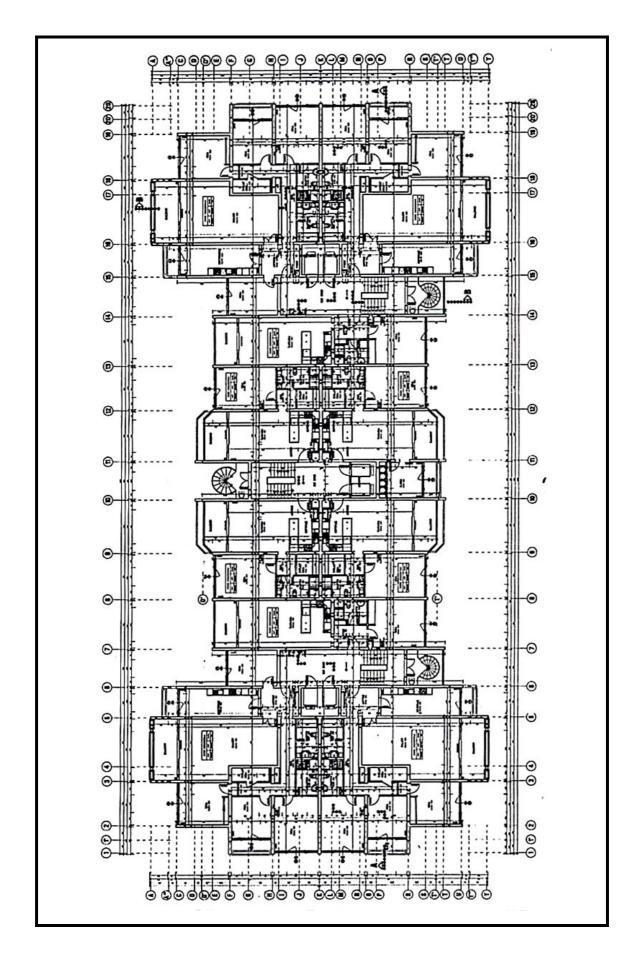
Mavişehir II; Kuğu 13th-Floor Plan
